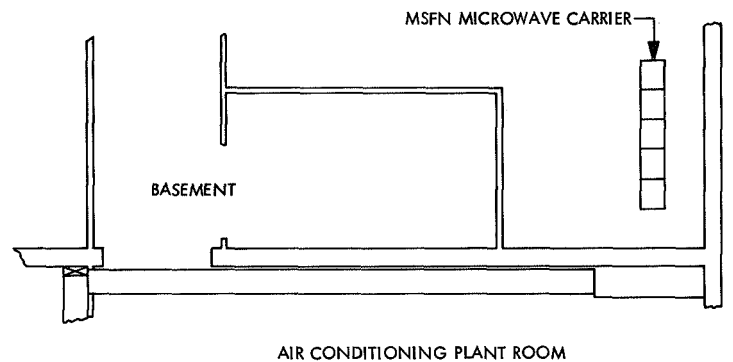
Manned Space Flight Network control room equipment layout at Tidbinbilla site
